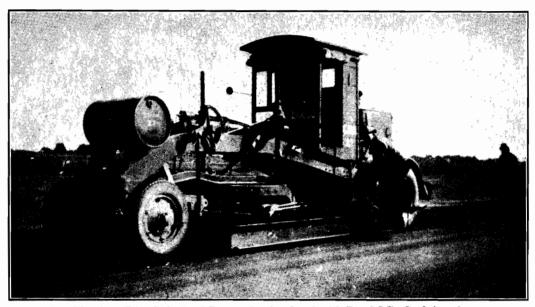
Diesel Engined Power Grader fitted with Road-Mix Seal Attachment.
